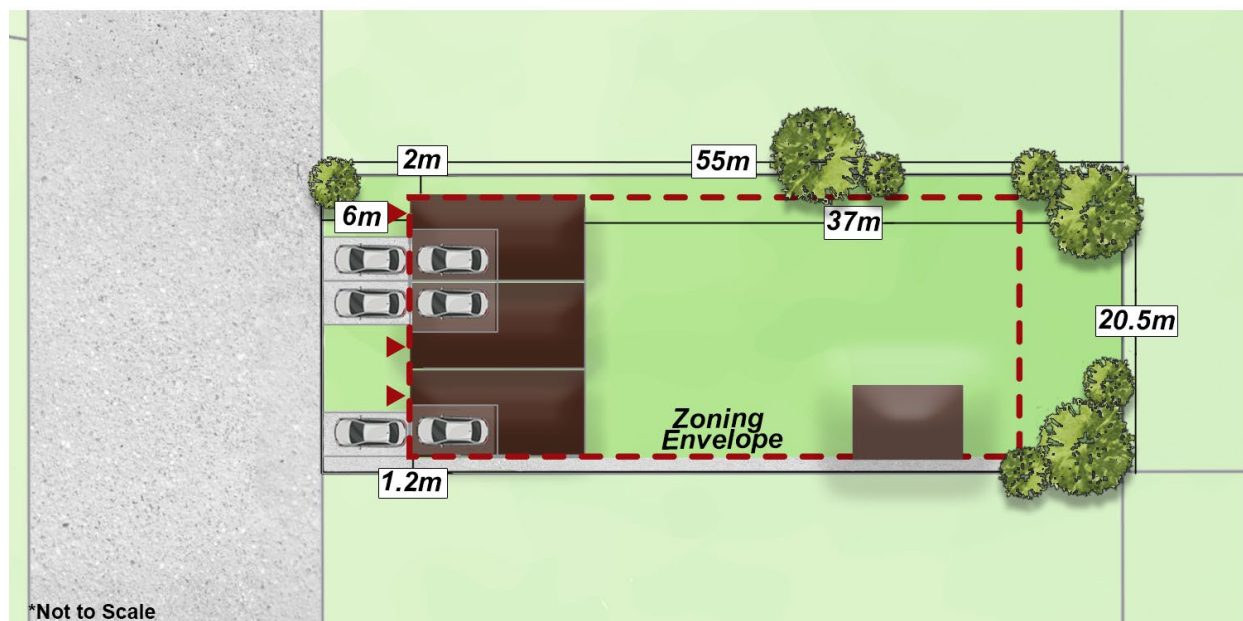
Traditional Townhouse Interior Lot Concept Plan
